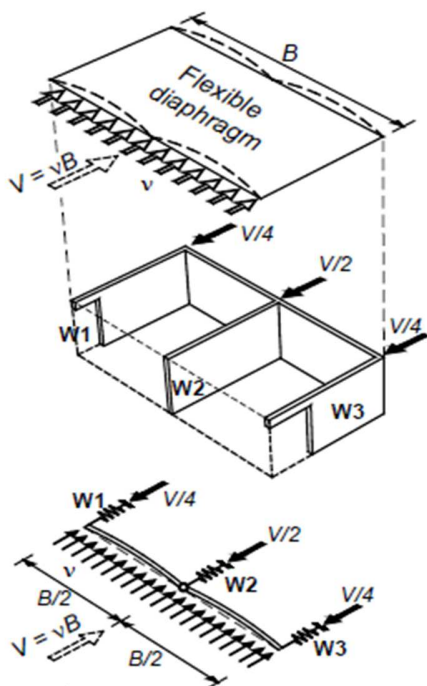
Distribution of Lateral Loads in Building with Flexible Diaphragm
